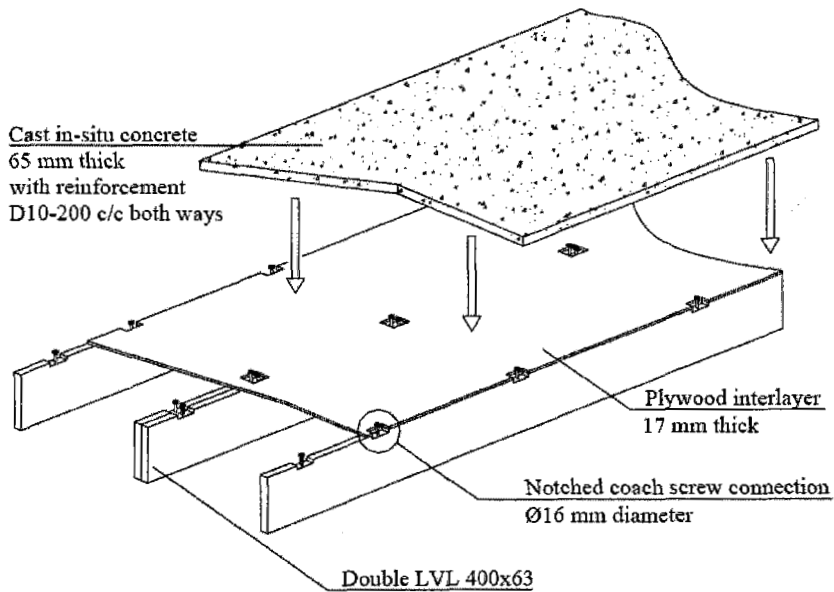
Proposed semi-prefabricated timber-concrete composite system
